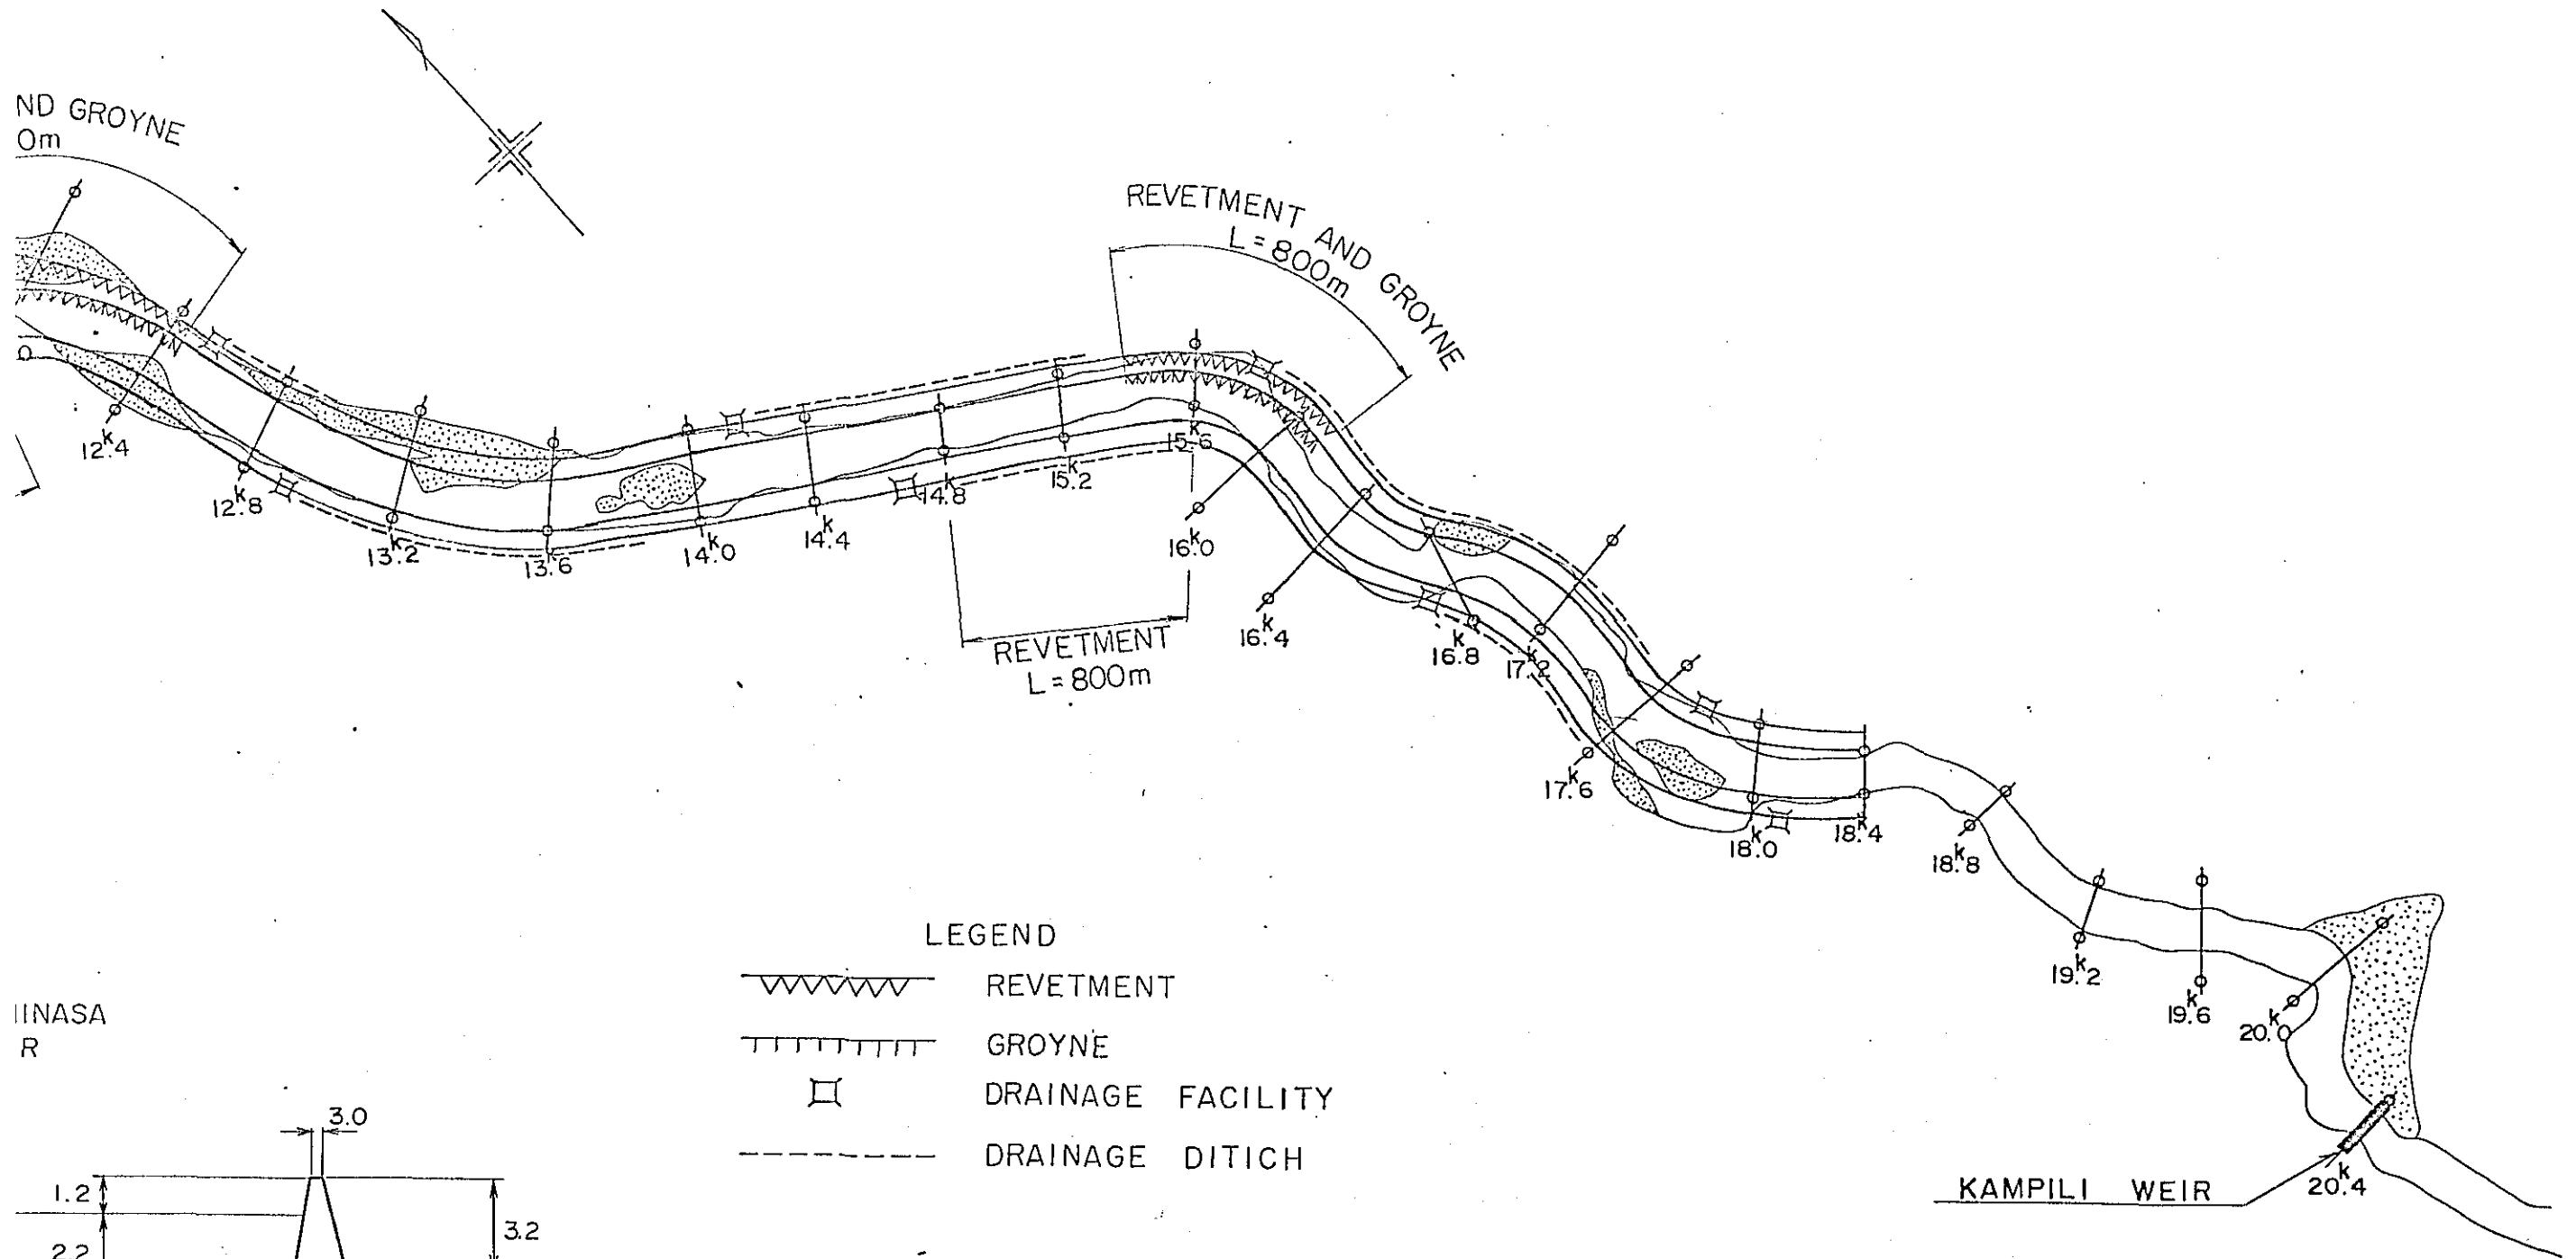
PROPOSED ALIGNMENT FOR OVERALL PLAN
